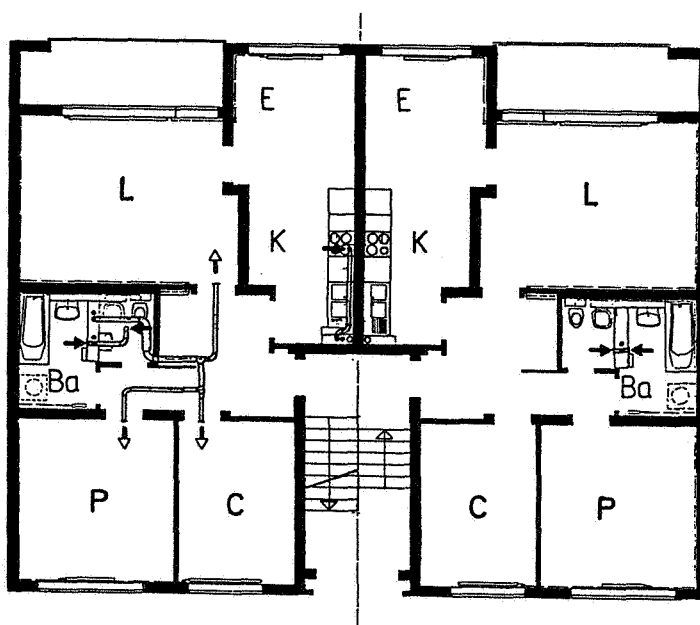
Groundfloor plan. On the left hand: mechanical ventilation system. On the right hand: balanced ventilation
